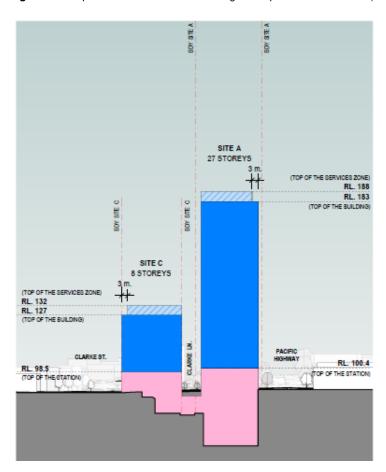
B: Proposed Crows Nest OSD building envelopes – cross section through the site (east-west)
